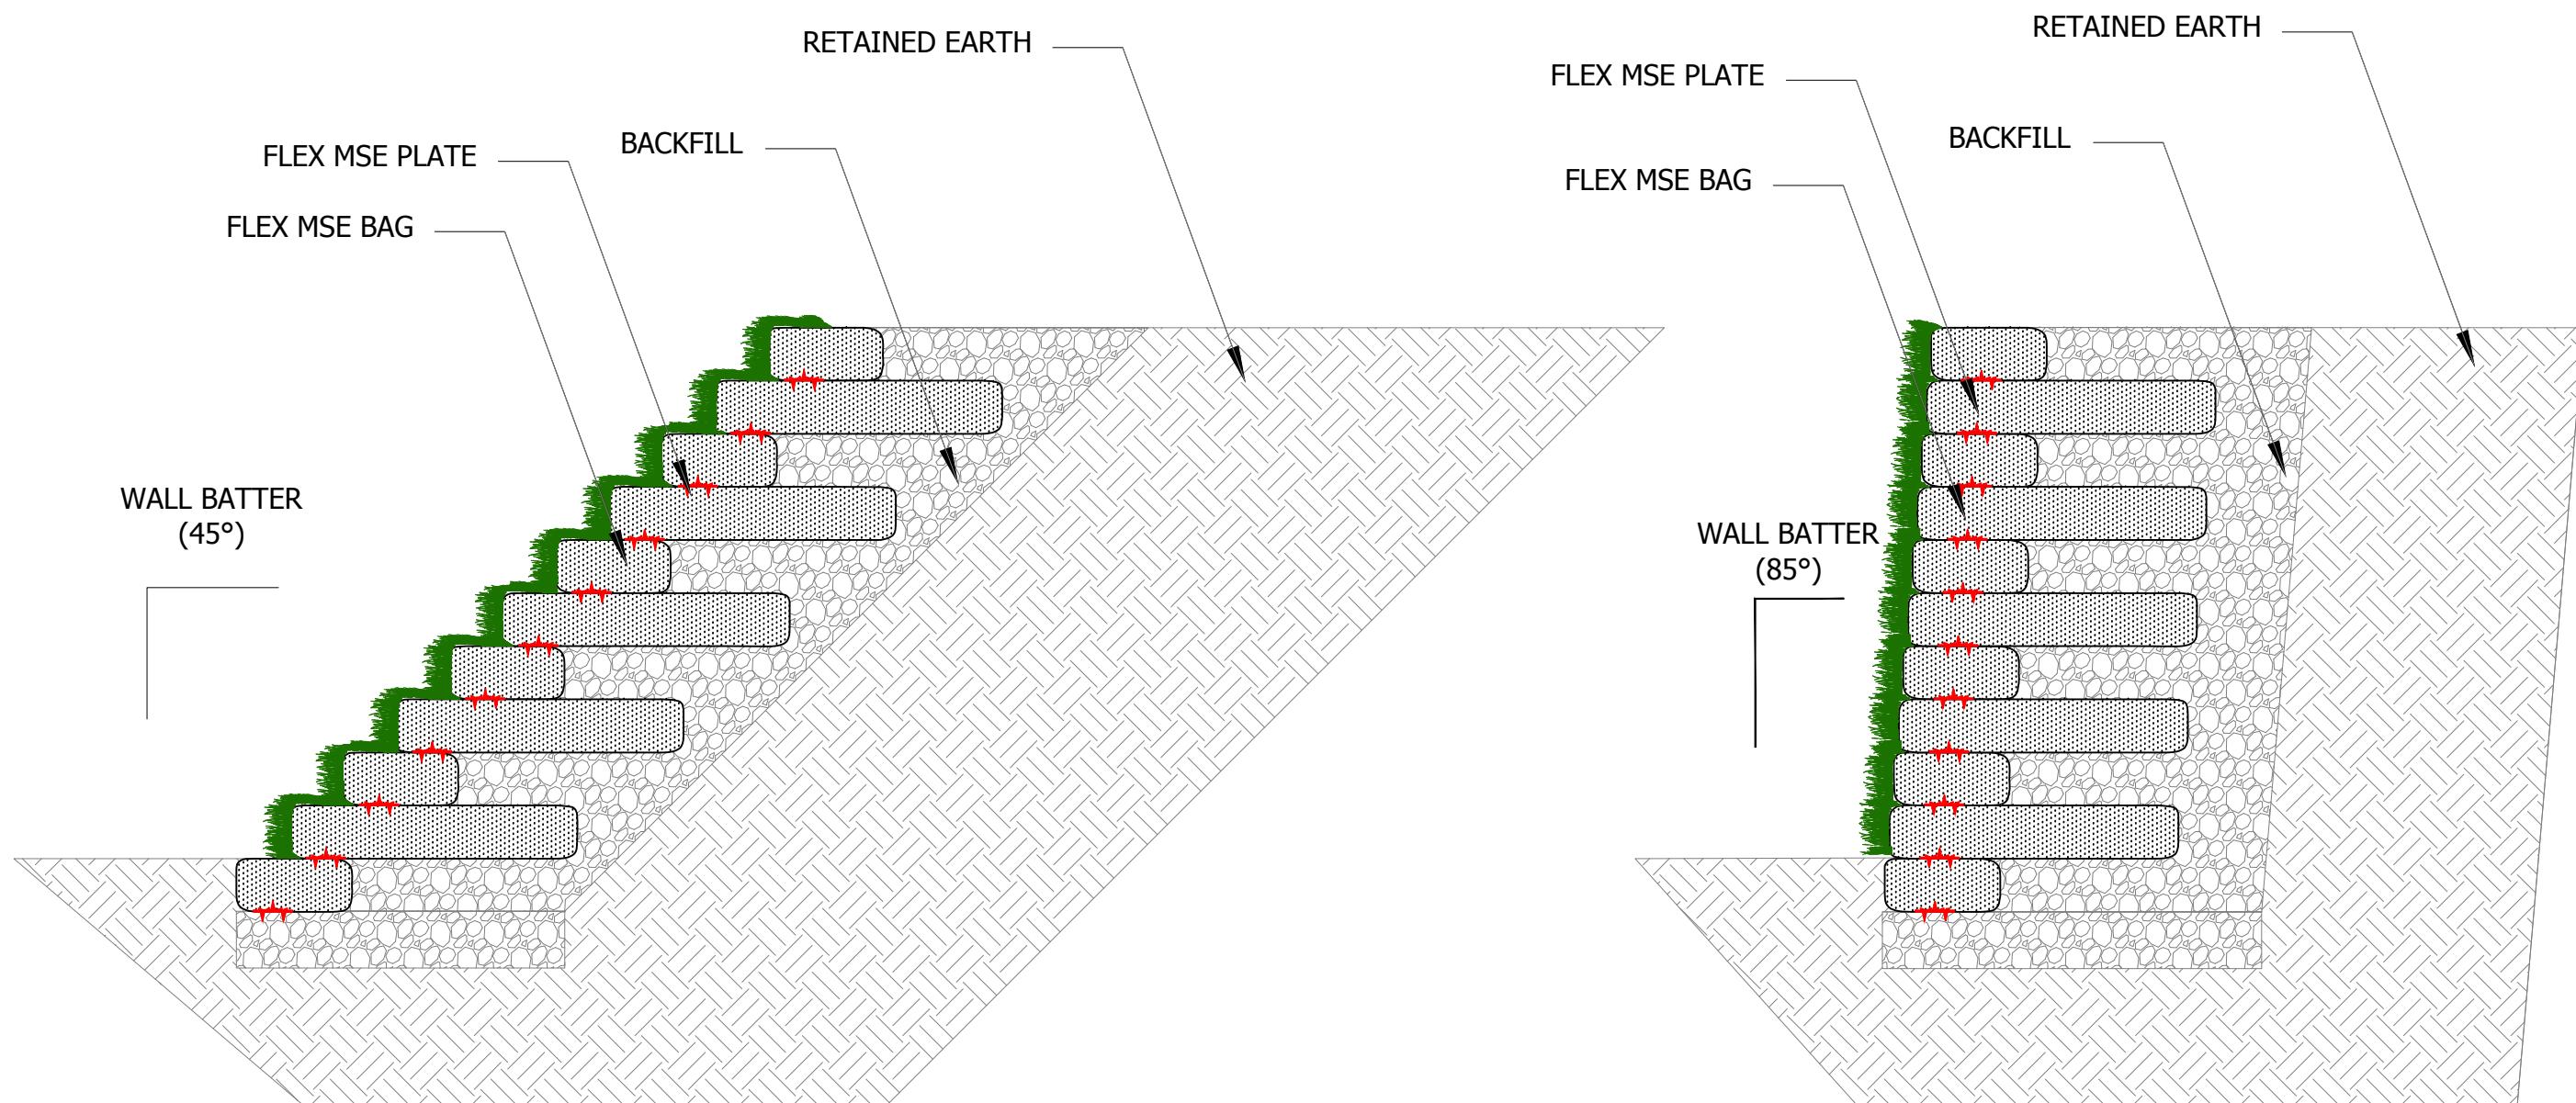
DETAIL SHOWS EXAMPLES OF THE MINIMUM AND MAXIMUM WALL BATTER. FACE ANGLE CAN BE VARIED SUBJECT TO DESIGN REQUIREMENTS.
